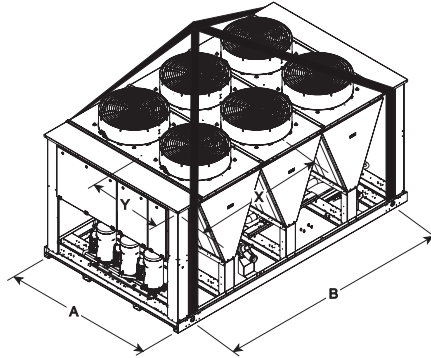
Unit Rigging Label Detail (010-060 Sizes)
